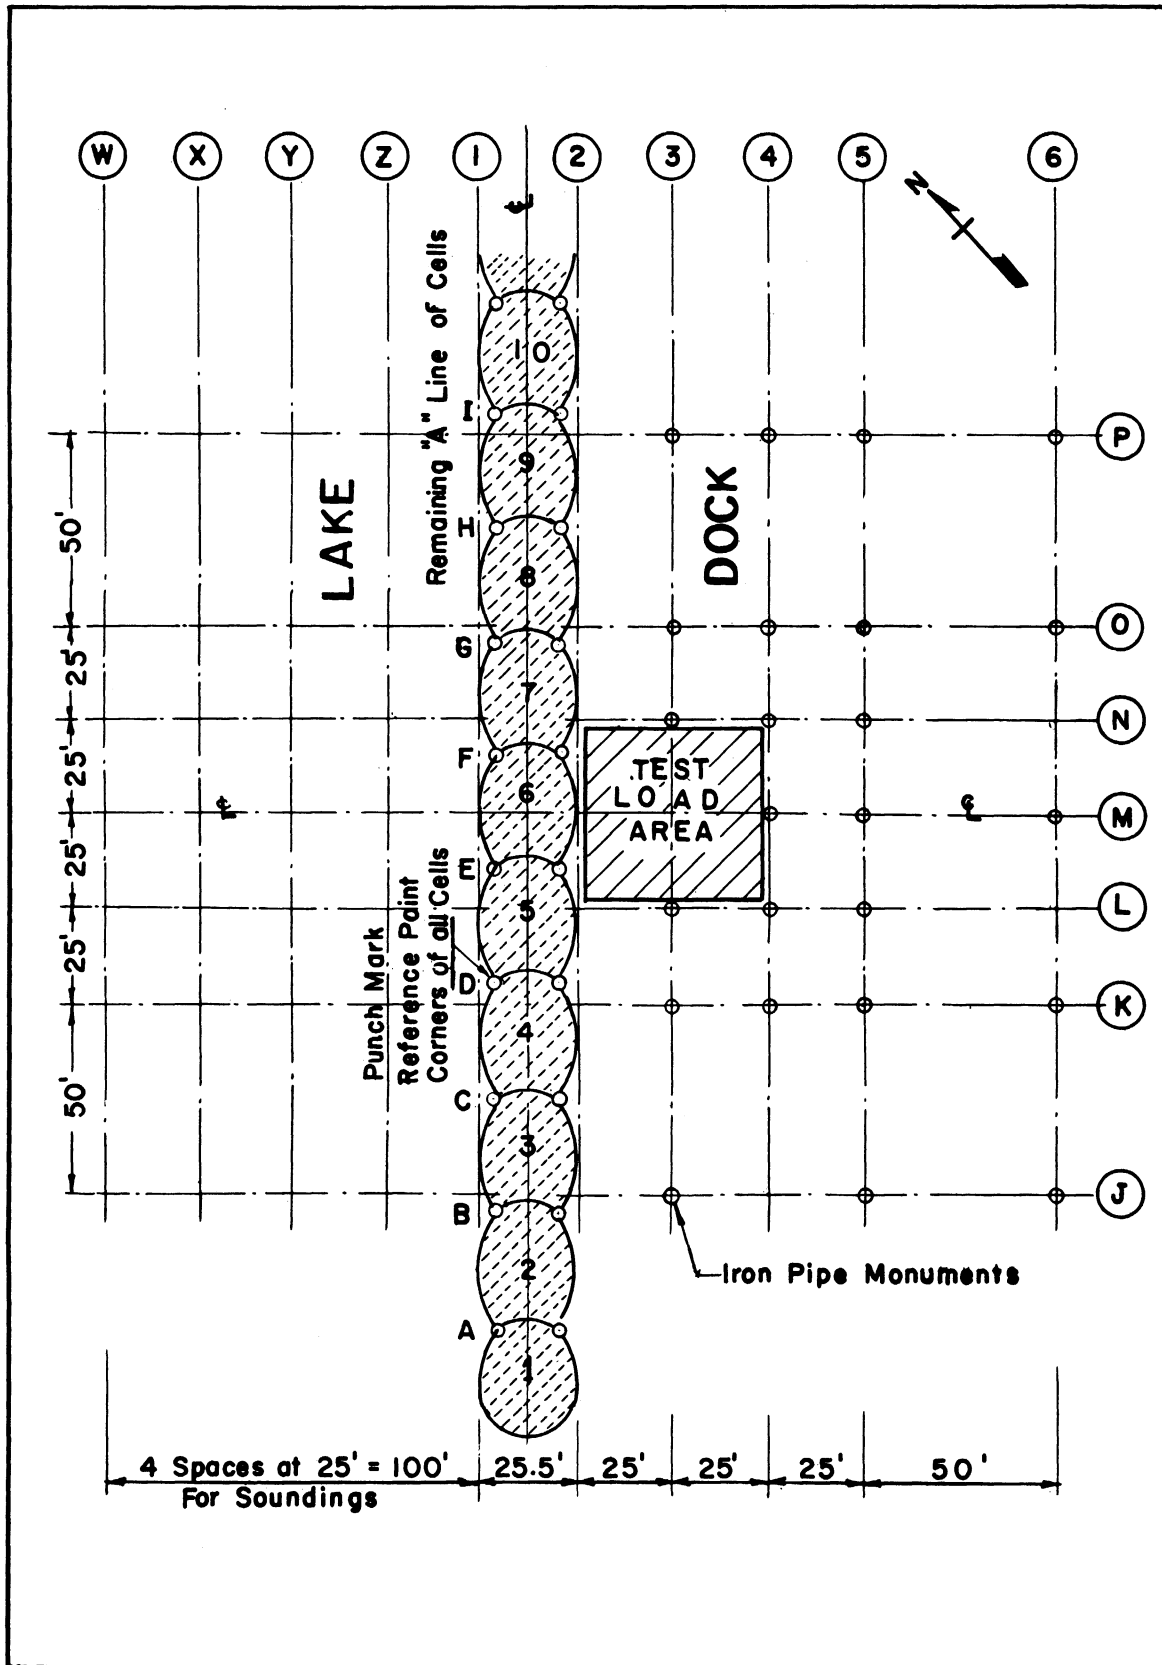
LOCATION PLAN OF MONUMENTS AT TEST SITE
